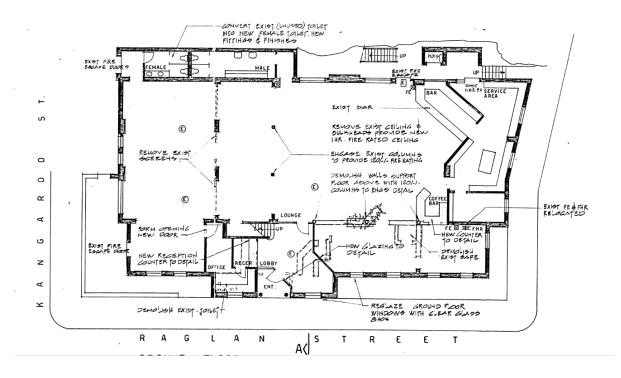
1994 lower ground floor plan (James Clifford, Van Architects 1994)
